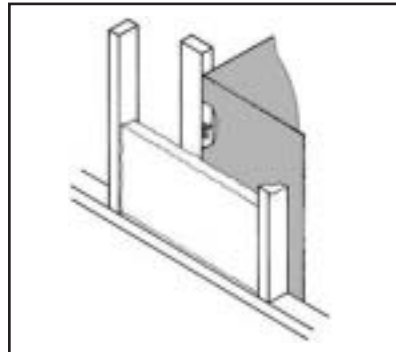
and Fig. 4-38b Gypsum board installation with drywall clips.
